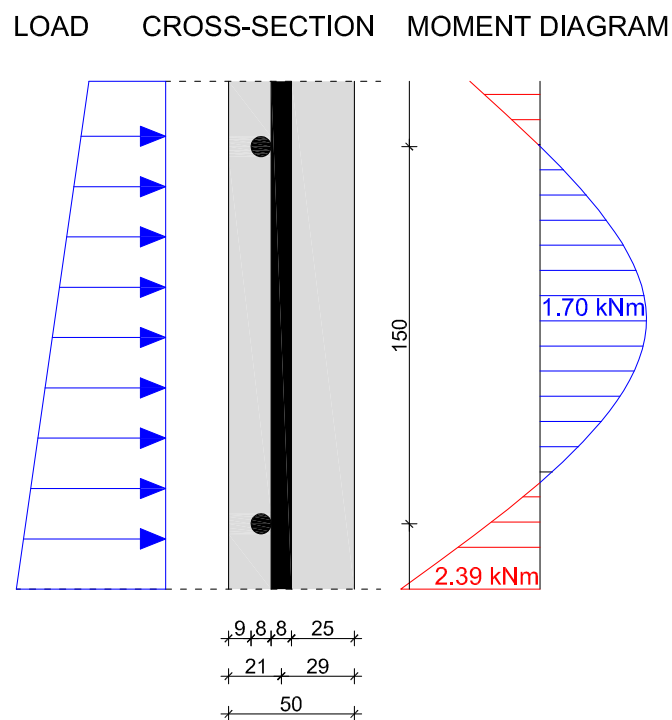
Closer view on the vertical strip loading with chosen reinforcement position [mm]
